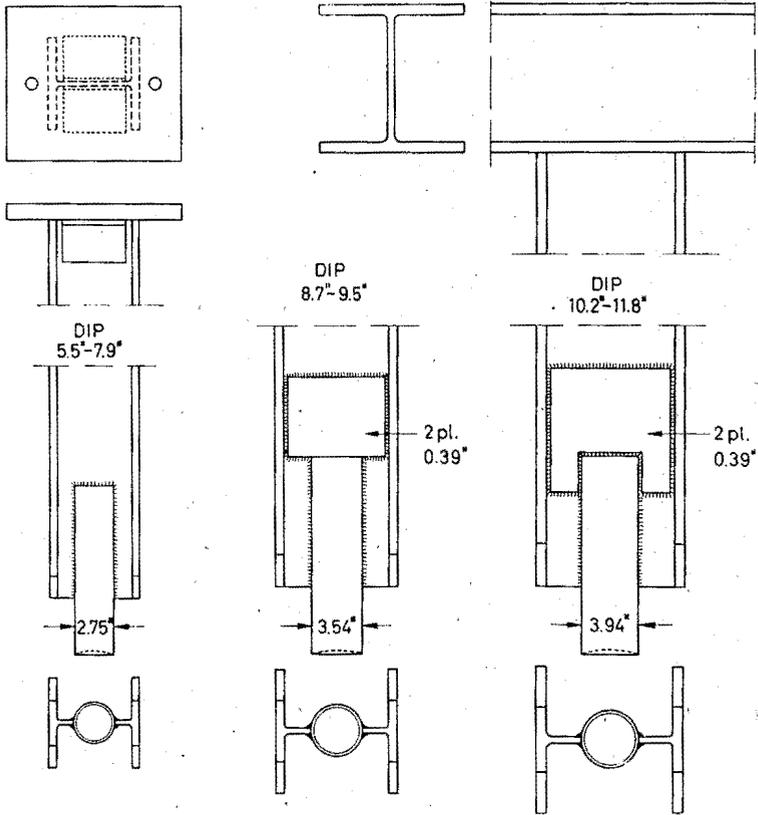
H-SECTION STEEL PILES WITH POINTS AND CAPS AS REQUIRED BY THE BUILDING AUTHORITY OF OSLO.
